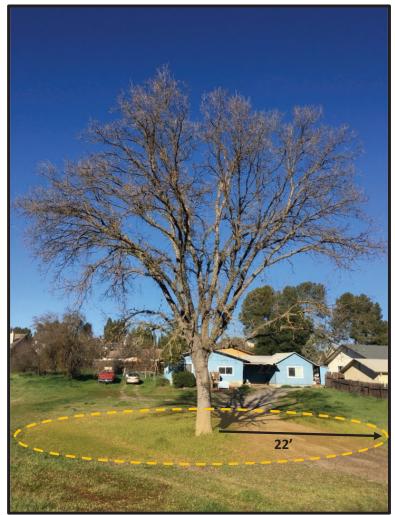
View of Tree 84 – 22' TPZ radius measured from outside of trunk. Set TPZ fence at 22'. Hand dig only - required when constructing retaining wall.
